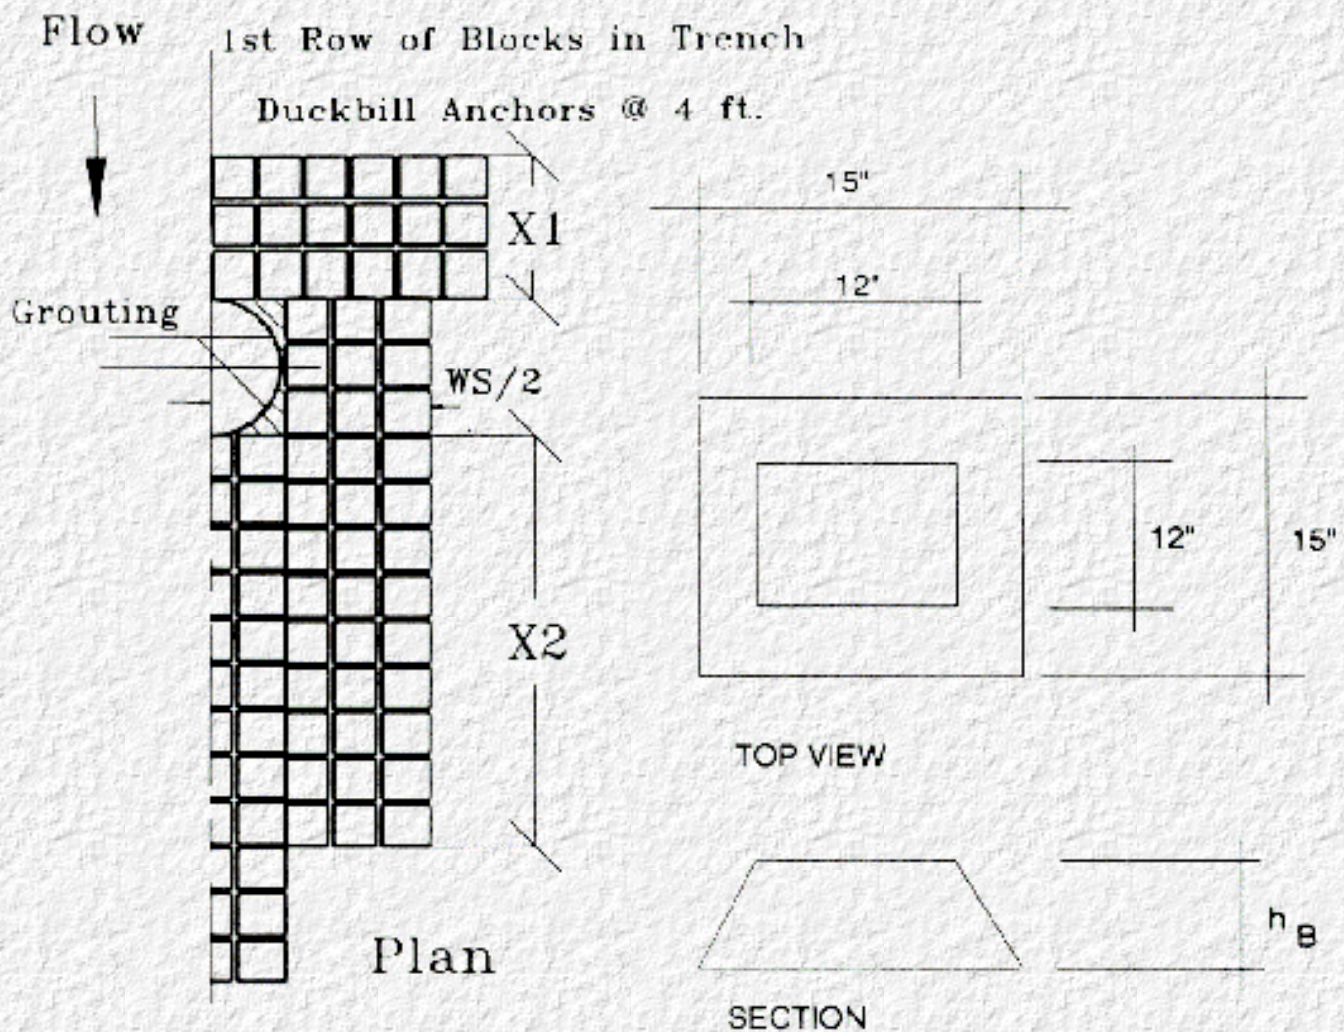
Suggested Cable-Tied Mat Dimensions for Scour Protection Around Circular Bridge Piers (McCorquodale)
